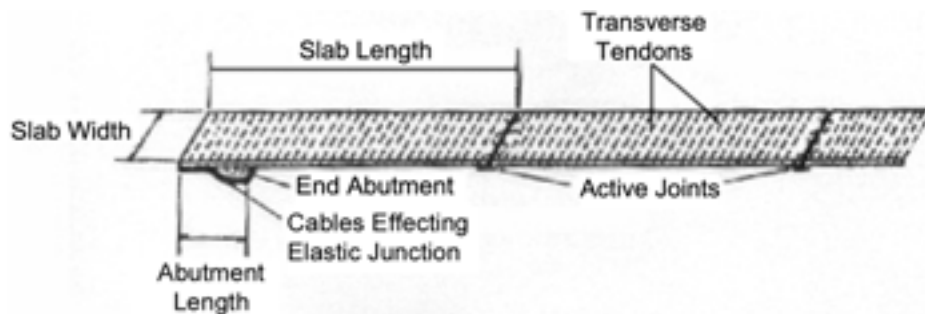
Schematic of a prestressed slab with elastic end abutments
